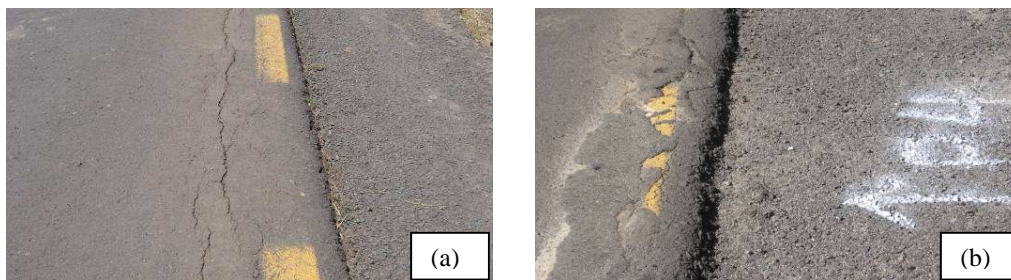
Typical unsealed and sealed longitudinal crack. Fig. 1a from Mgangira & Paige-Green (2008)
